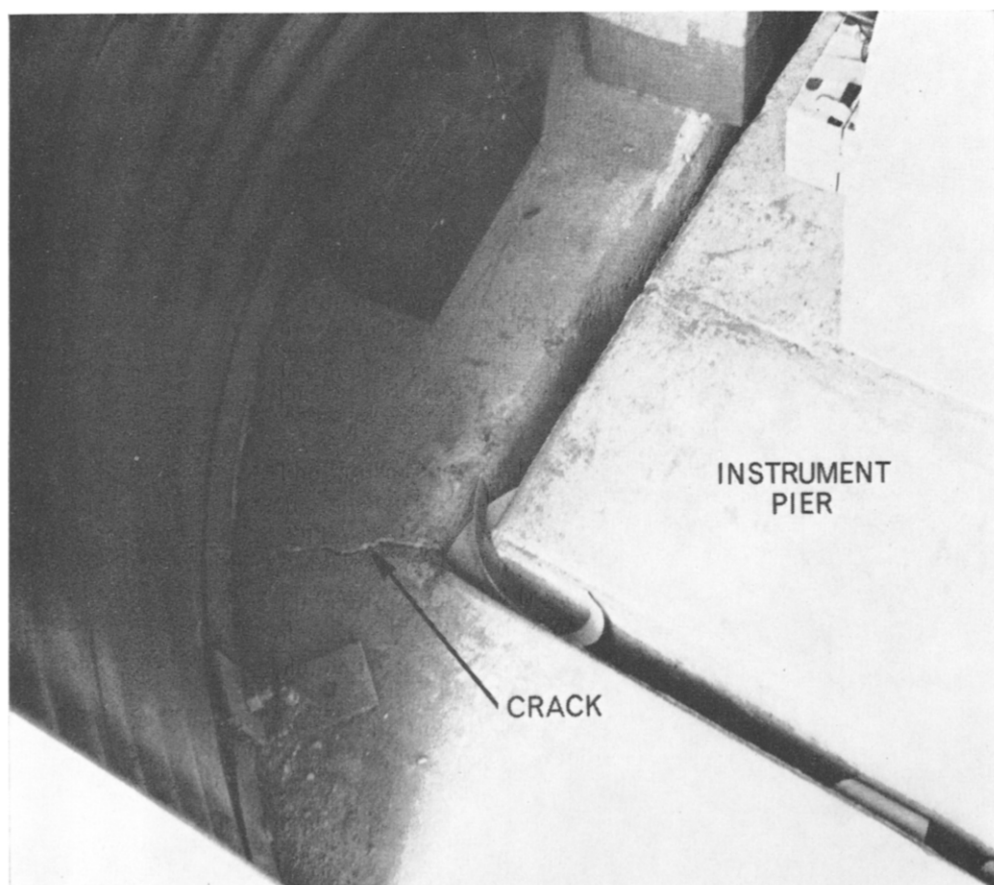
Cracks in the foundation of the instrument house.
